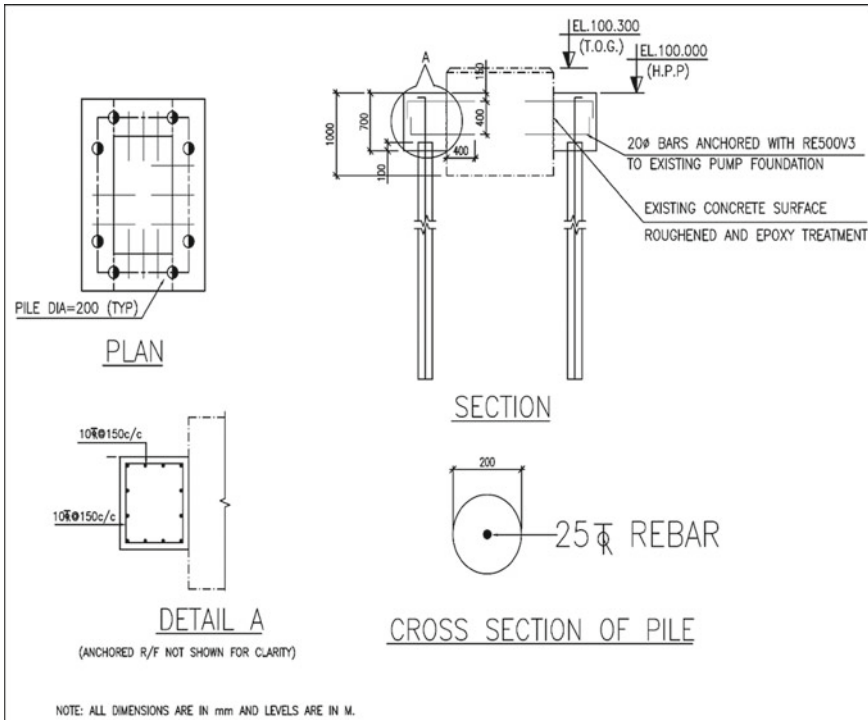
Typical arrangement of micropiles with existing pump foundation system
